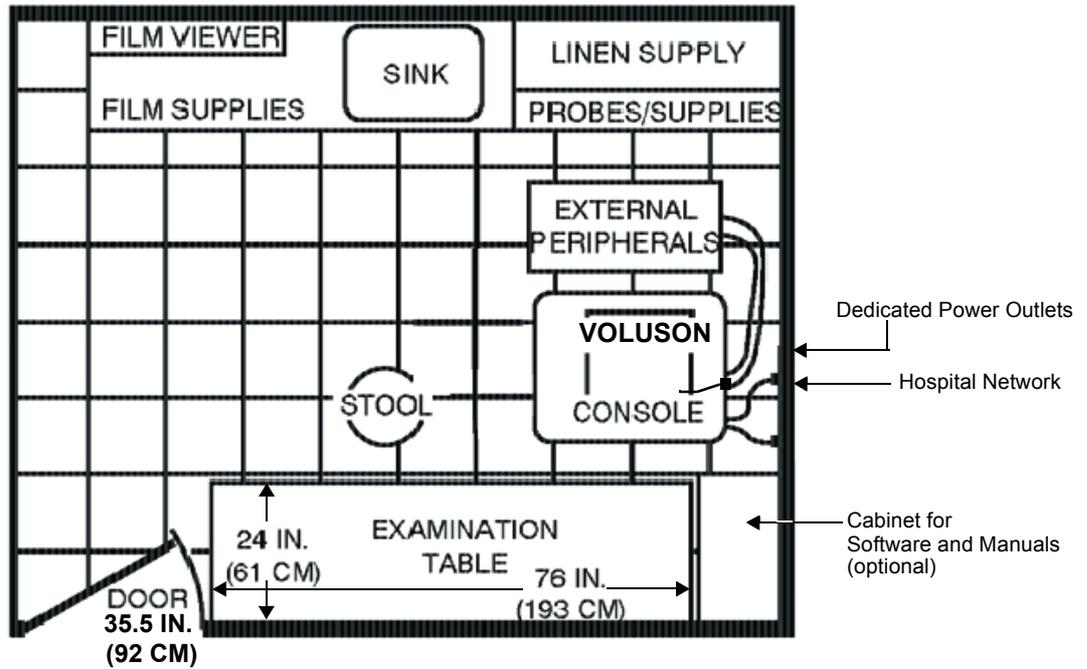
Recommended Floor Plan 4.3m x 5.2m (14ft x 17ft)
